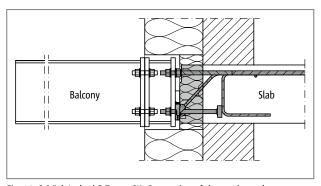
Schöck Isokorb® T type SK: Connection of the steel member to an adapter that equalises the thickness of the outer insulation
